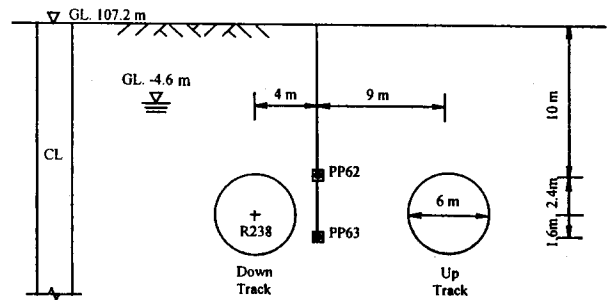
Soil Profile and Instrument Layout at Section 257T1
